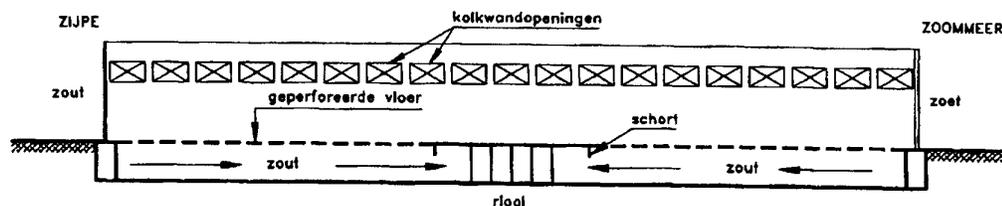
Longitudinal section of the Krammer locks (Rijkswaterstaat, 2000).
